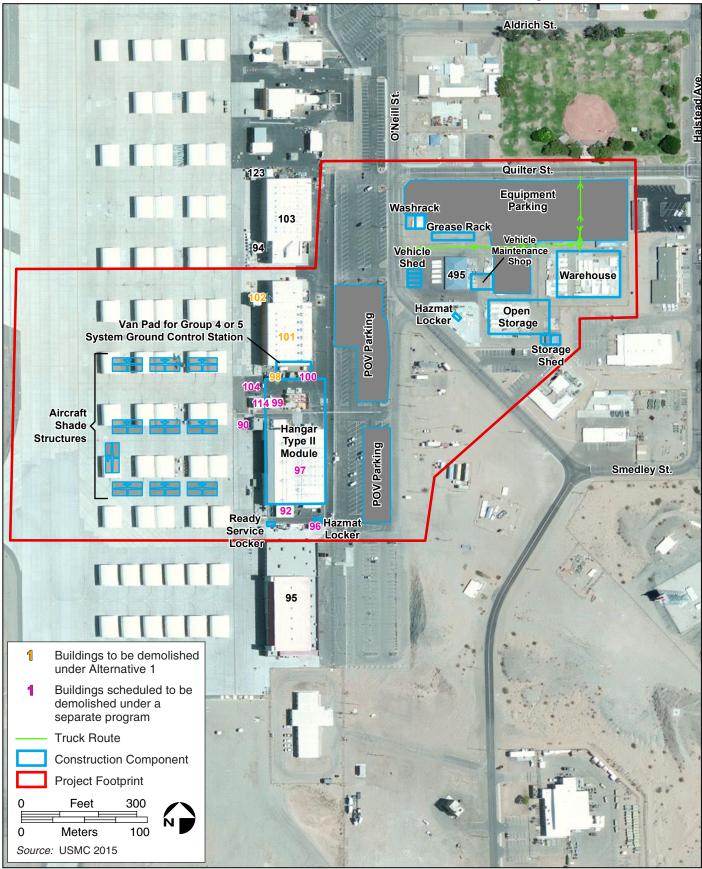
Alternative 1 - MCAS Yuma Conceptual Project Layout
